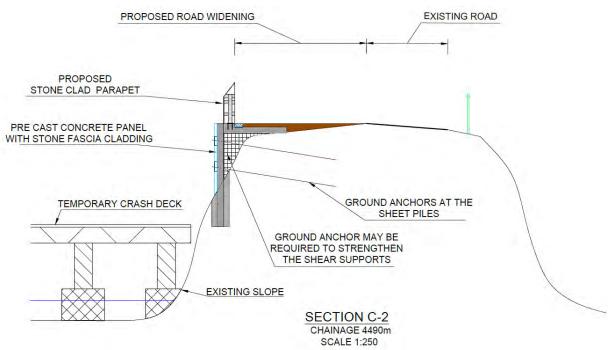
Option 2 - Ground Anchoring and Concrete Panels – As proposed on Drawing 60283248-D-008-002
